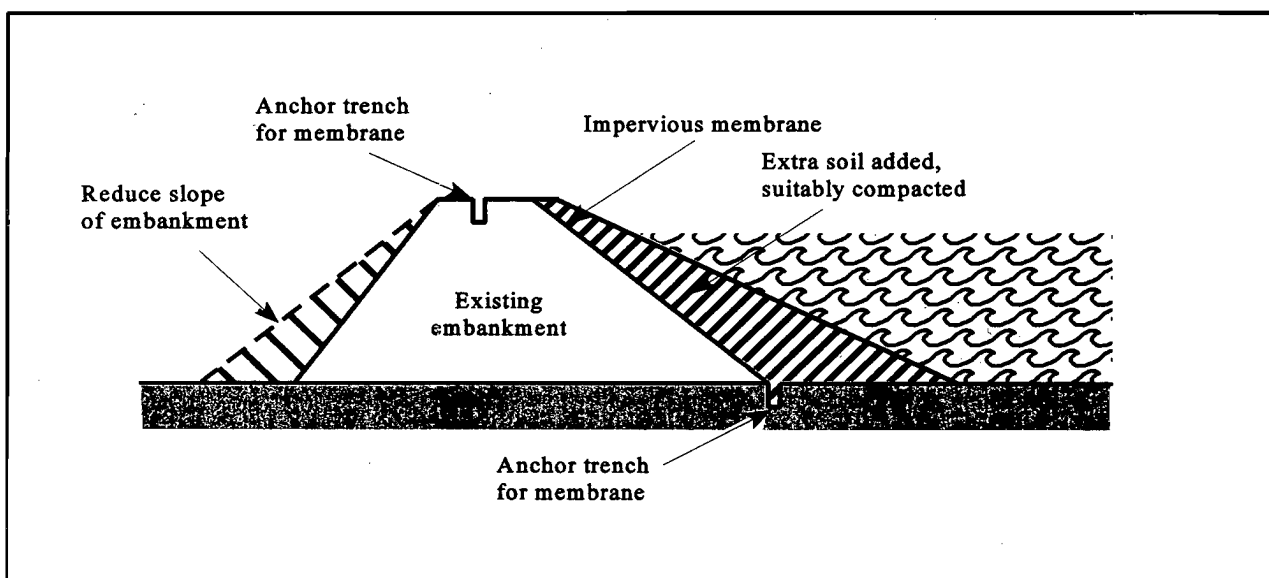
Repairing the downstream collapse of the wall caused by seepage through the wall
